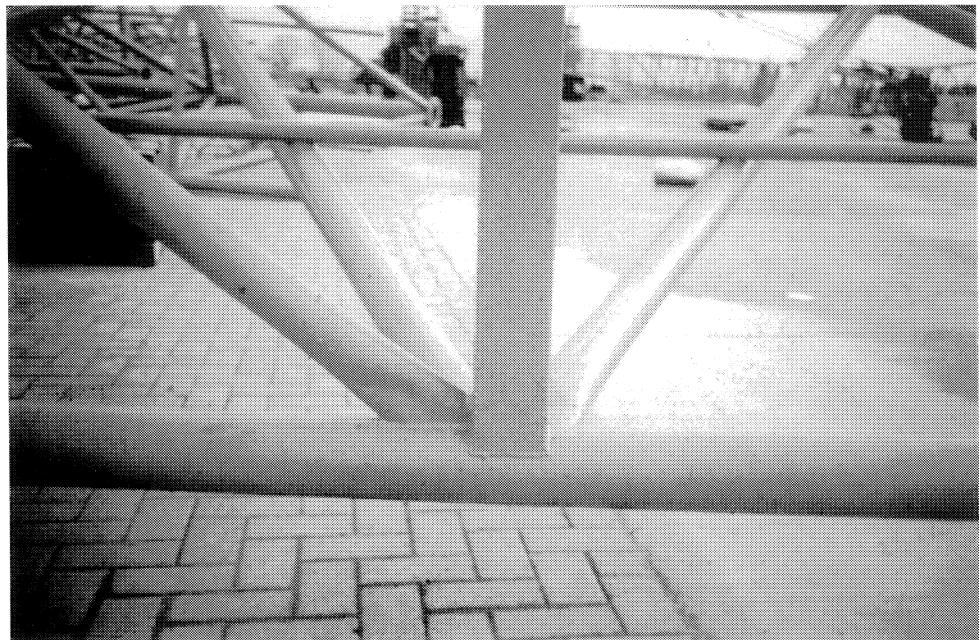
Welded connection with flattened CHS bracing ends
